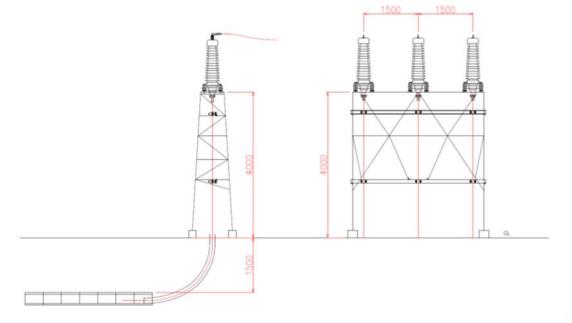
Example of Air-Terminated Connection Trestle Layout
